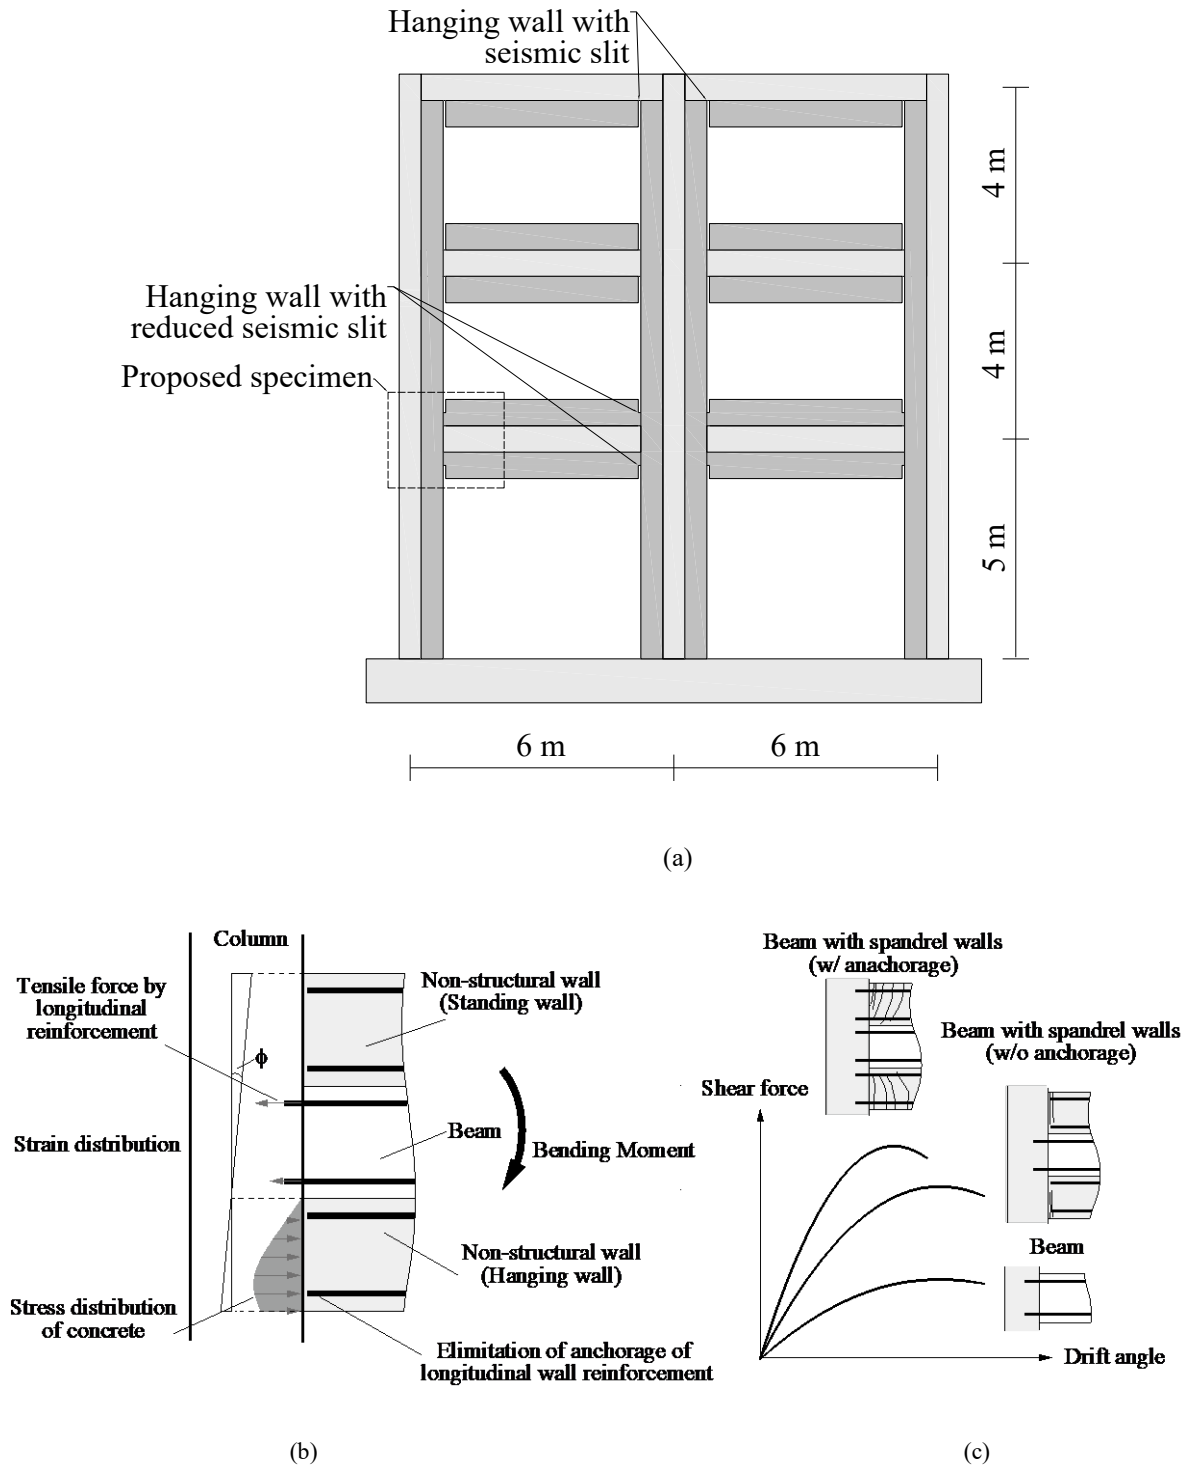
Proposed new detailing of reinforced concrete member with non-structural walls: (a) specimen position in the frame; (b) working mechanism; (c) expected performance
